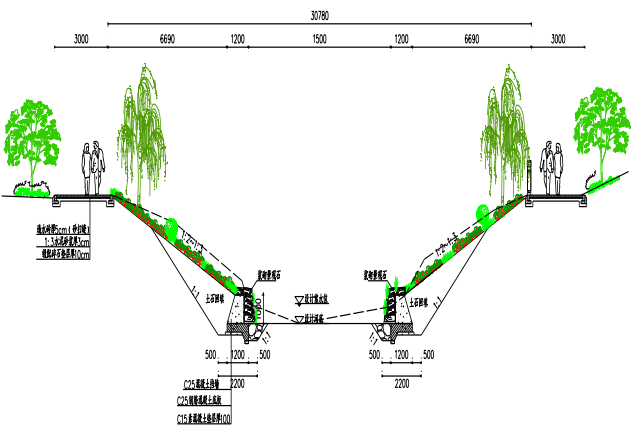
Proposed Cross Section of Dayu Stream (Changshou)
